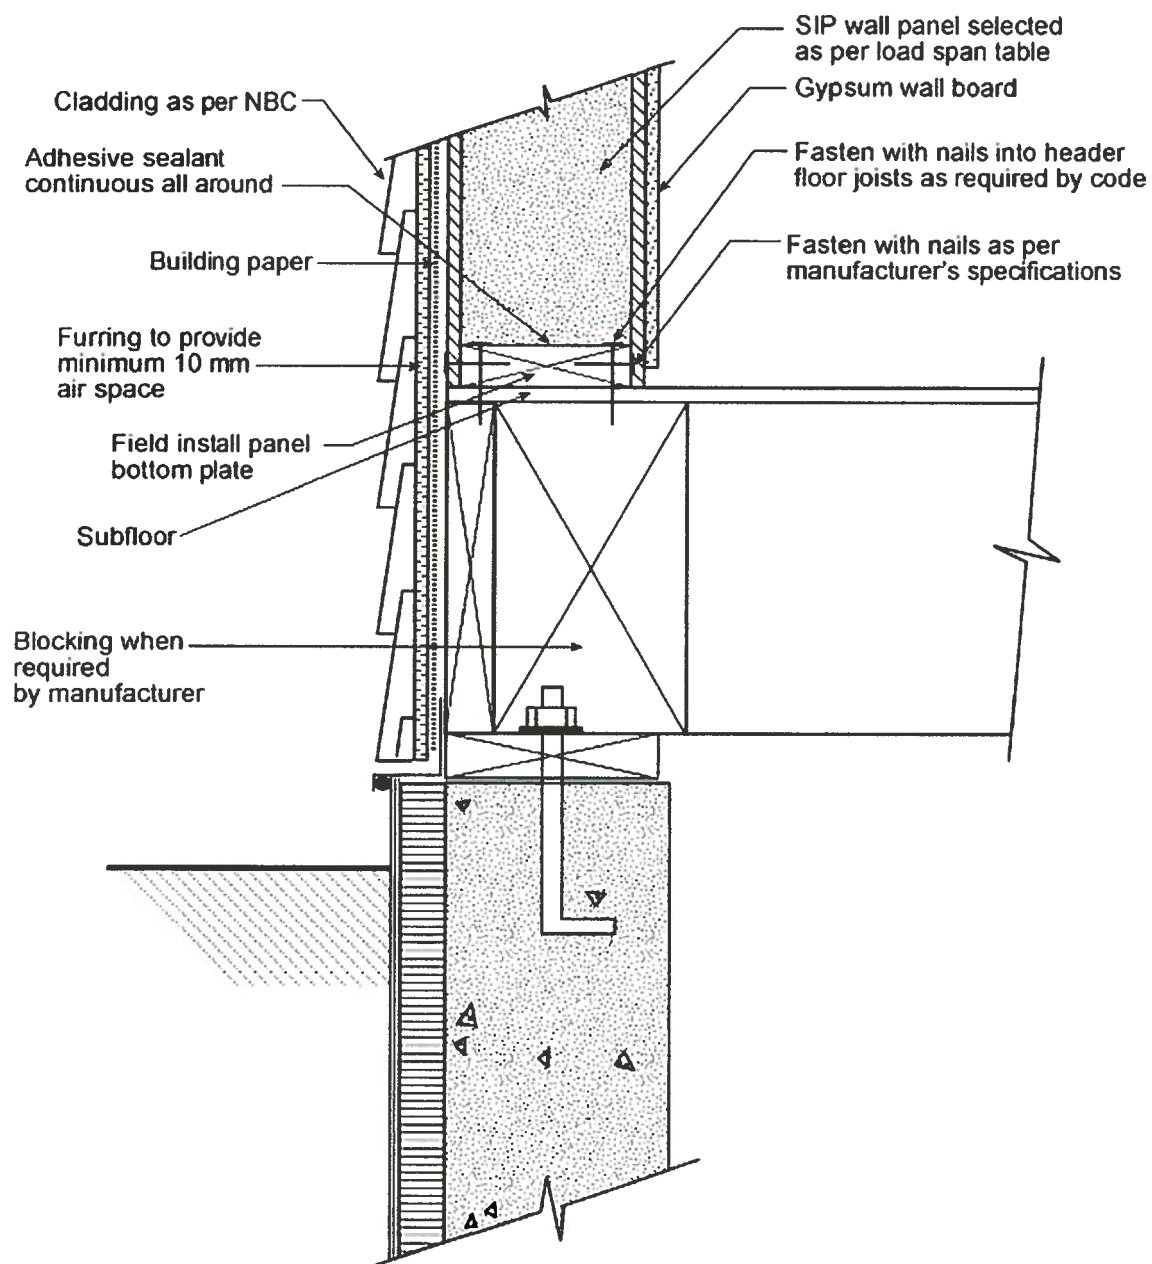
"Insulspan SIP System" – details of a wall panel connection to floors and rainscreen cladding. See manufacturer's details for sealant and tape requirements.
